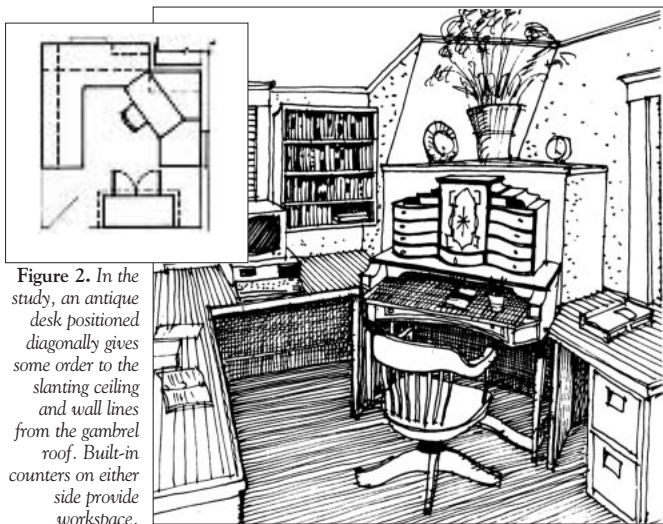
In the study, an antique desk positioned diagonally gives some order to the slanting ceiling and wall lines from the gambrel roof. Built-in counters on either side provide workspace.
